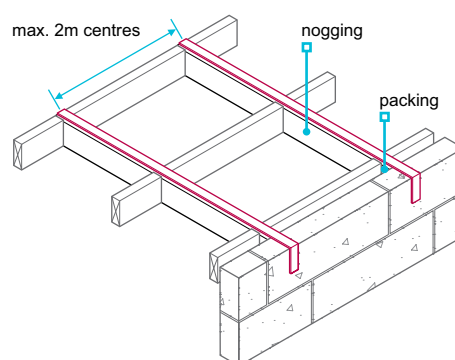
Restraint strap fixed to solid timber joists parallel to external wall
